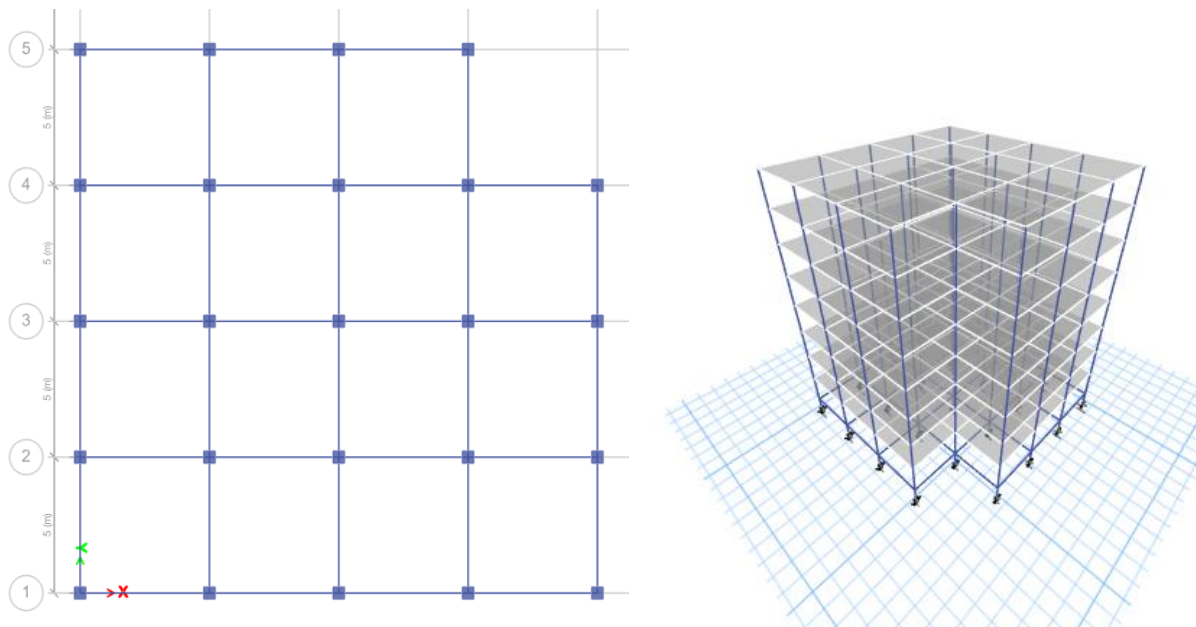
Views of L-shape building (a) Plan view, (b) 3D linear appearance
